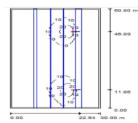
Luminaire arrangement, spacing and road width on Cikampek-Cipularang freeways
